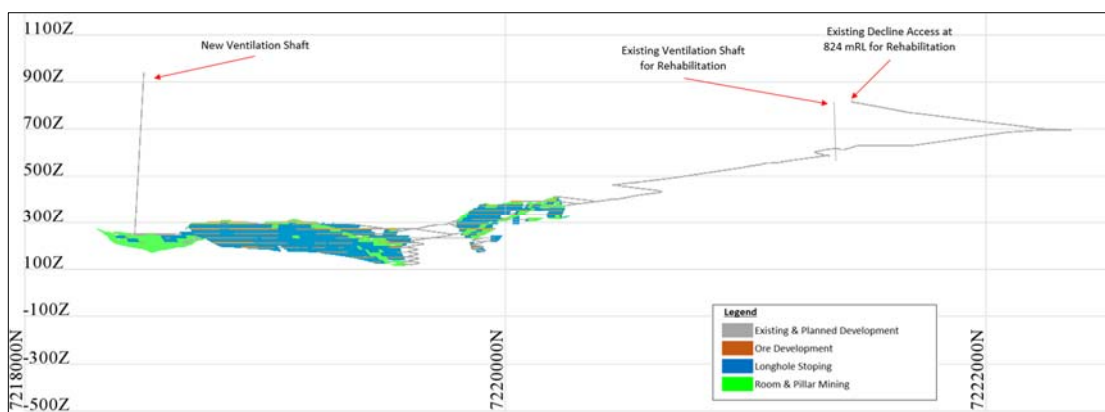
Long view of the Stekenjokk Mining Inventory by mining method and existing and planned development, looking northwest
